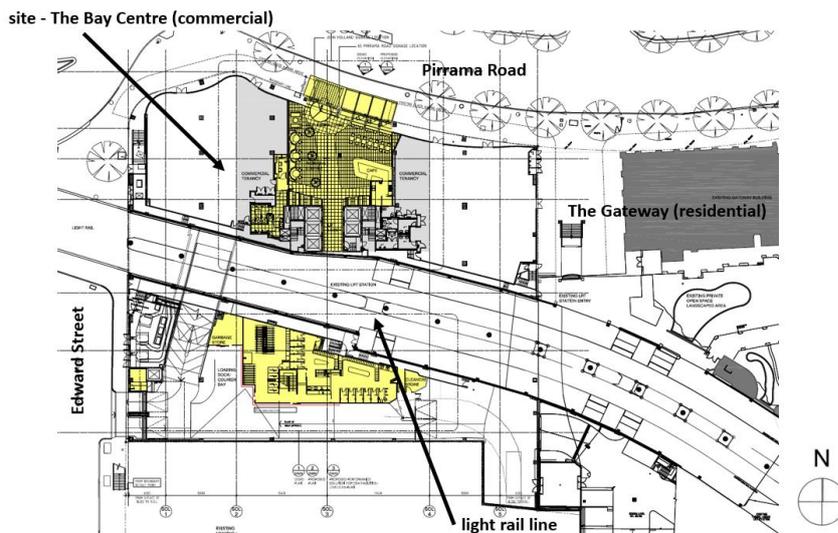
Proposed end of journey facilities (southern end) and entry foyer plans (northern end). The light rail line is shown beneath and intersecting the site.
